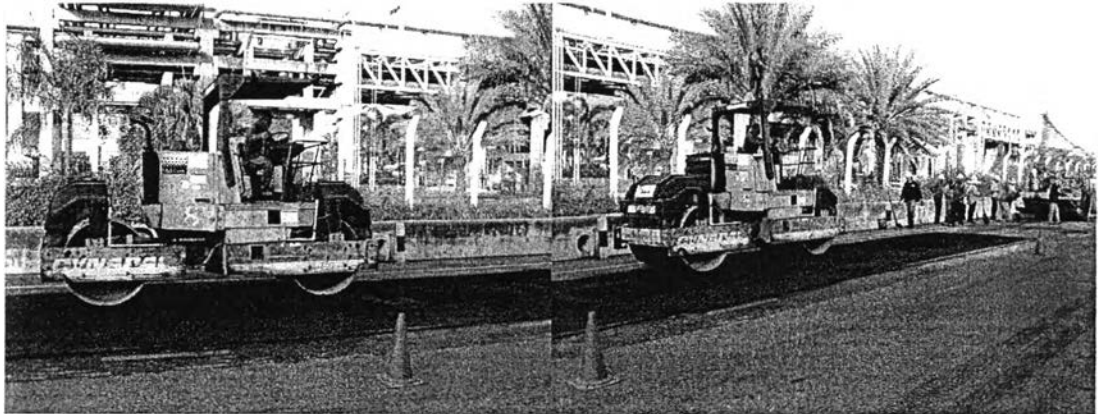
Steel drum rollers (DYNAPAC CC211).
